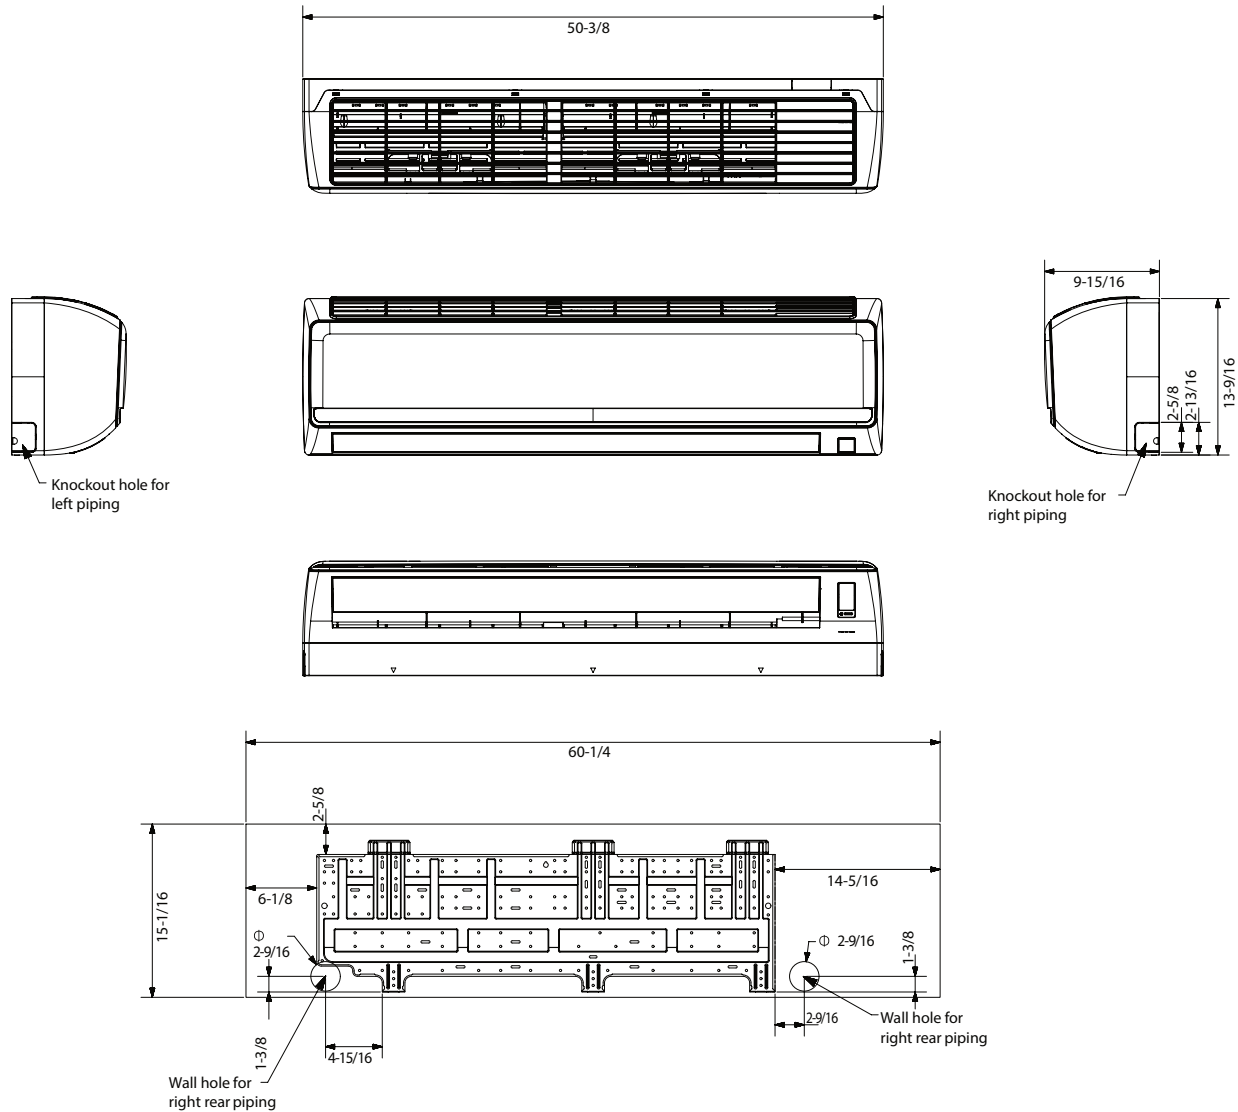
Indoor unit dimensions: 4MUW4524A10N0
